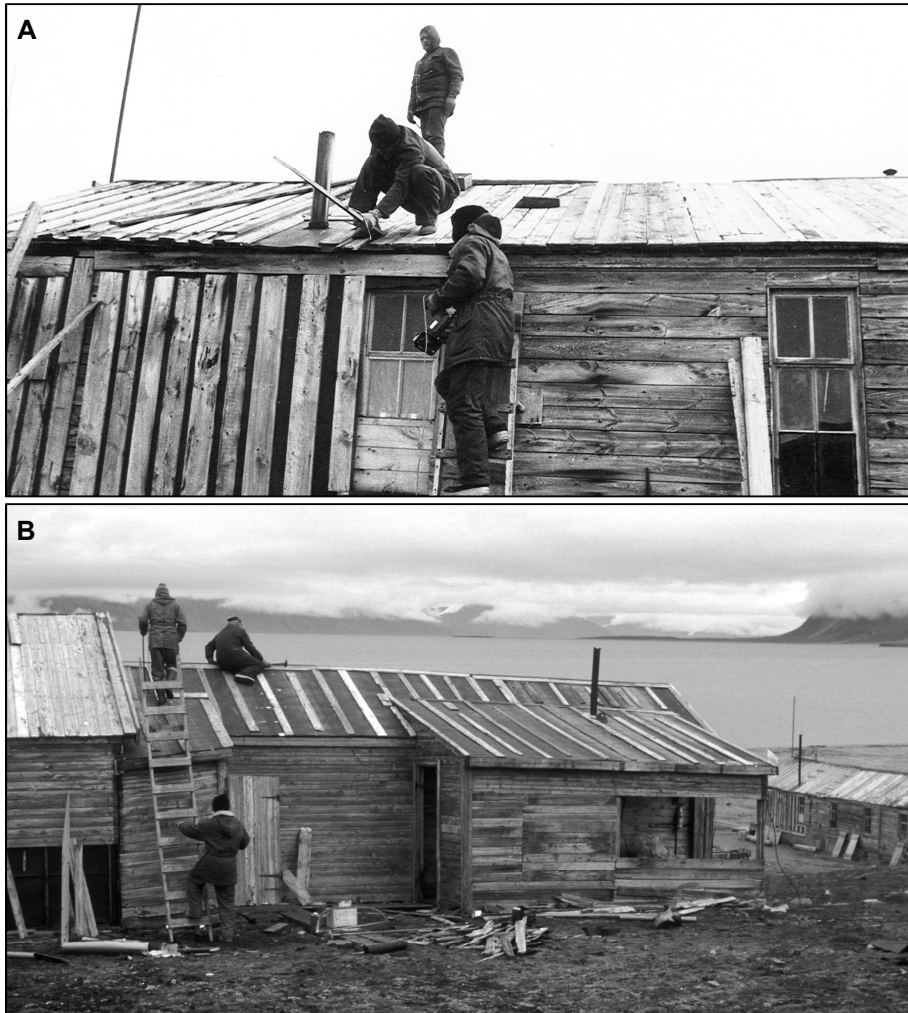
Renovation of: A- the main building (A) (Photo K. Pękala 1986), B- storage building (B) (Photo K. Pękala 1986).
